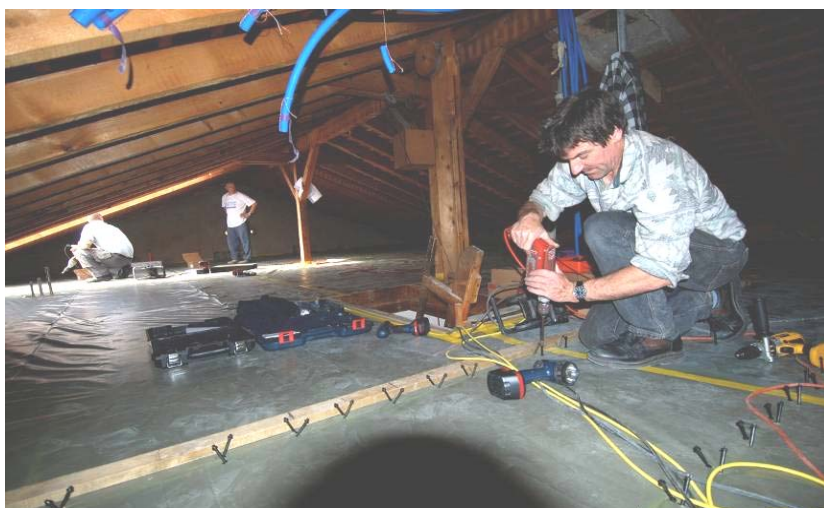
Mounting of reinforcement screws of the combined wood-concrete slab for the new attic floor
